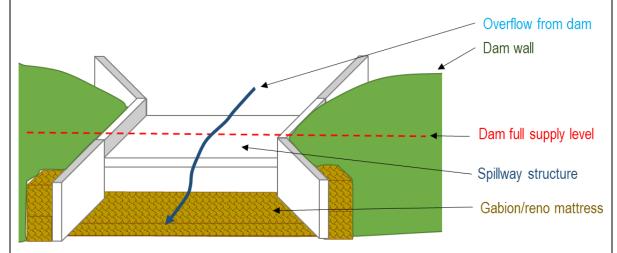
The spillway should be indented in the dam wall. Erosion control structures (gabions/reno-mattress or riprap) should be implemented at the outlet side of the spillway.
